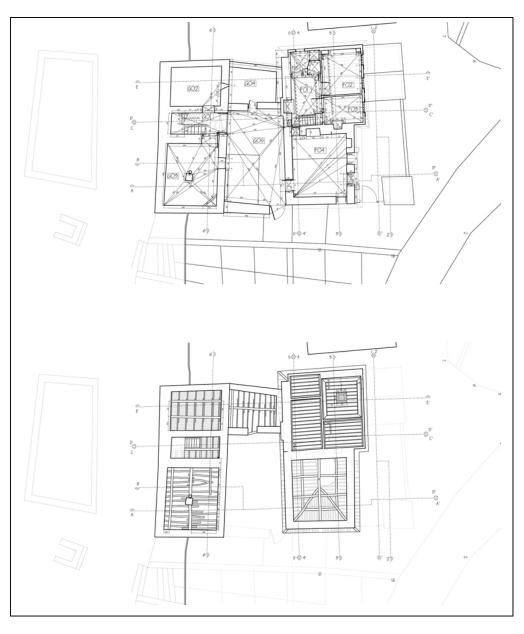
Plan and ceiling plan of Yenigün and Çarboğa Houses at +4.00
